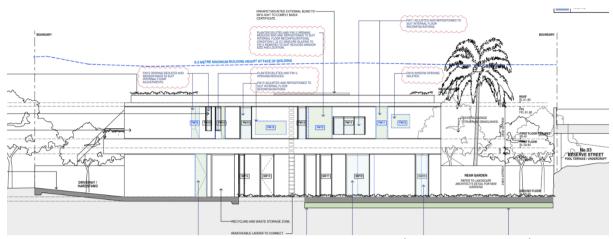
Proposed retaining wall on the eastern boundary (highlighted in green), Eastern Elevation - 455.09 Rev B
